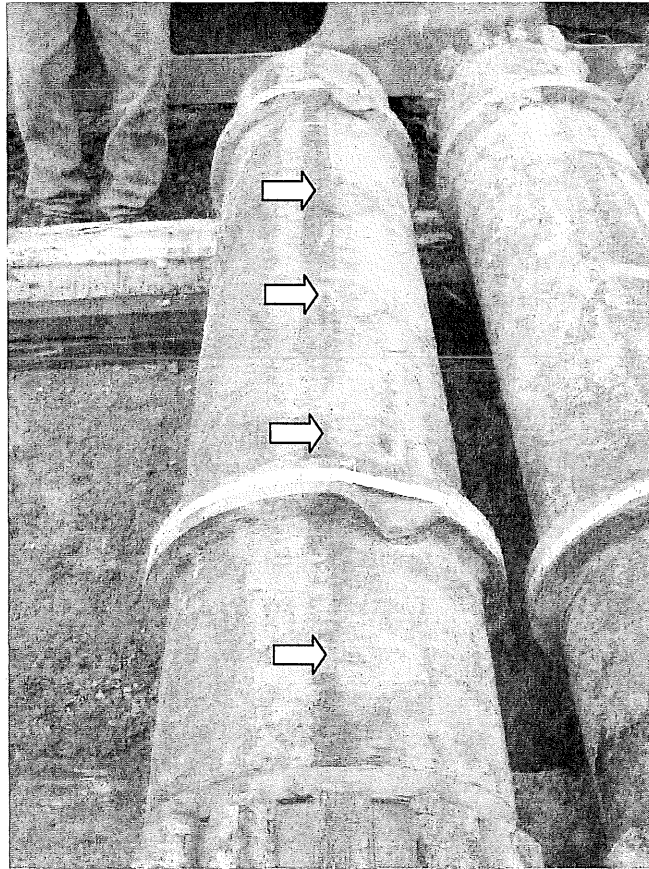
Impact markings from base plate anchor bolts on second roller from north in Pier 6E bearing.
